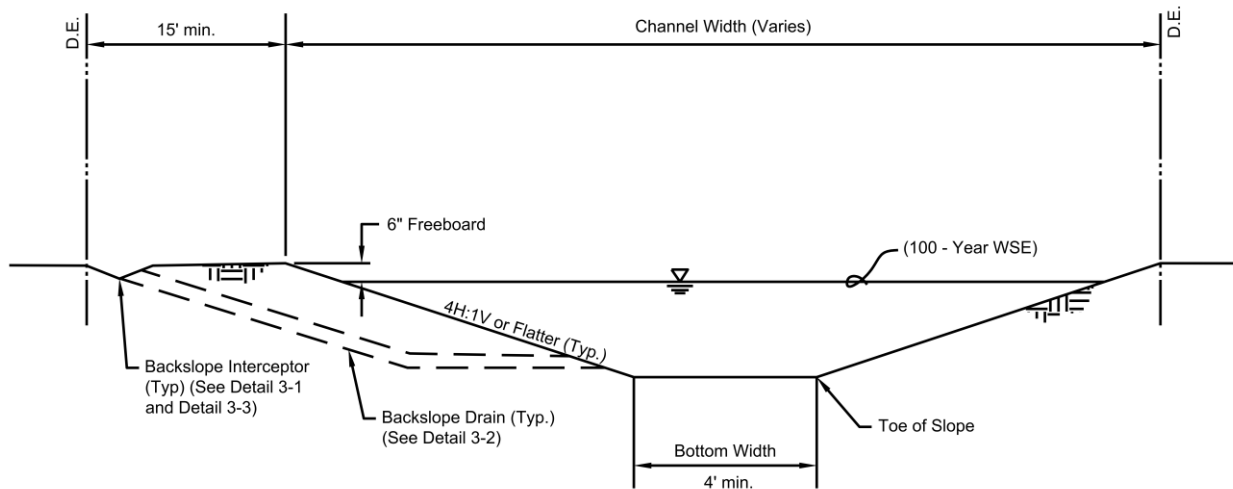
Typical Grass-Lined Trapezoidal Small Channel Section
